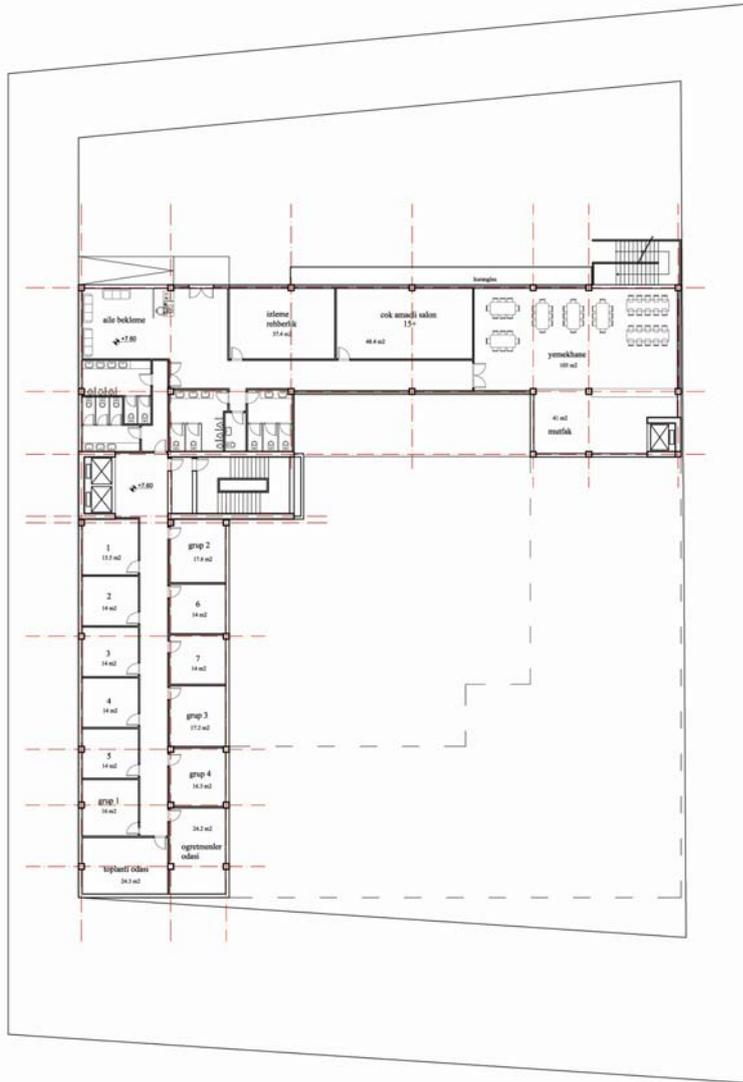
Second Floor Plan / Preliminary design for Private İlgı Special Education School
